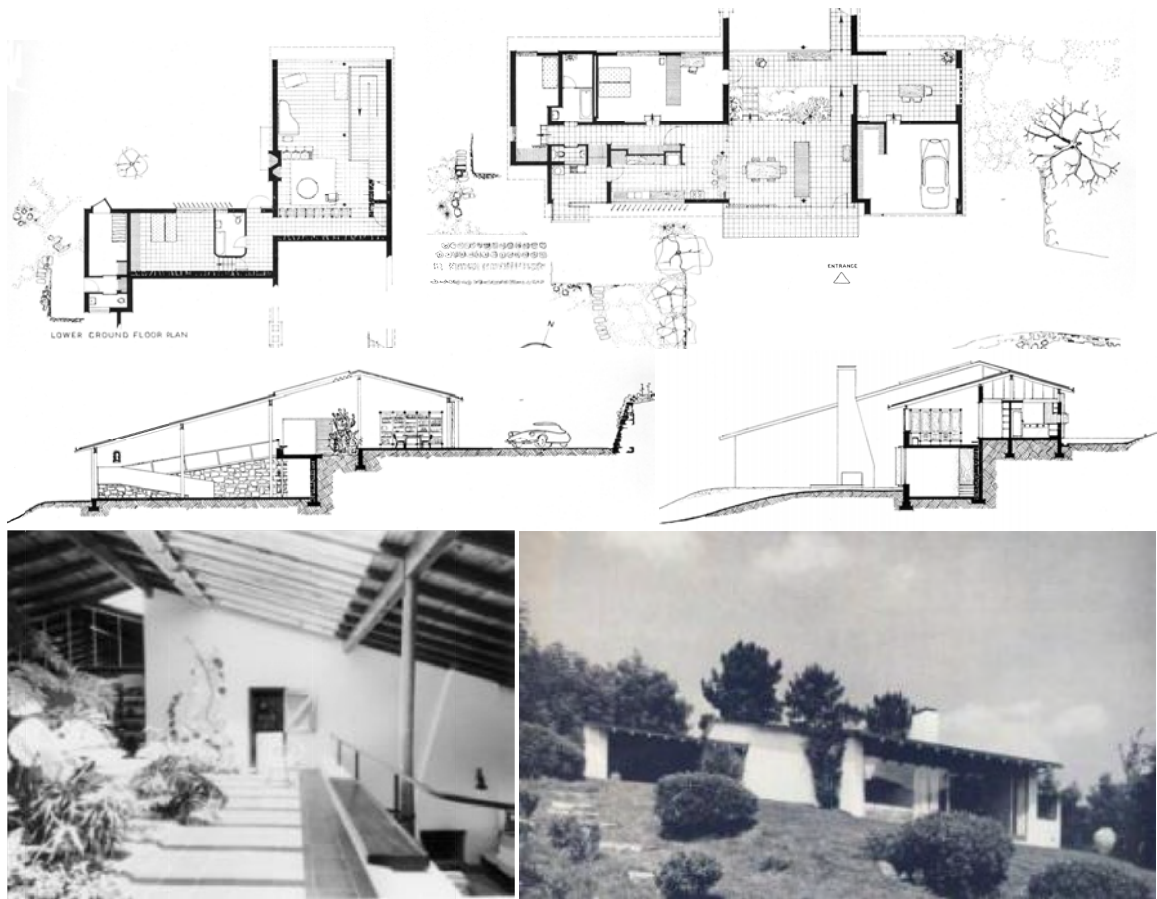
Previous page: House Keurbos (1951), Bishopscourt, Cape Town, lower ground and ground floor plans (Fagan archive). Top: Sections (Architect and Builder, November 1959:38). Bottom: inner court (Fagan archive) and view from garden (Architect and Builder, November 1959:34).
